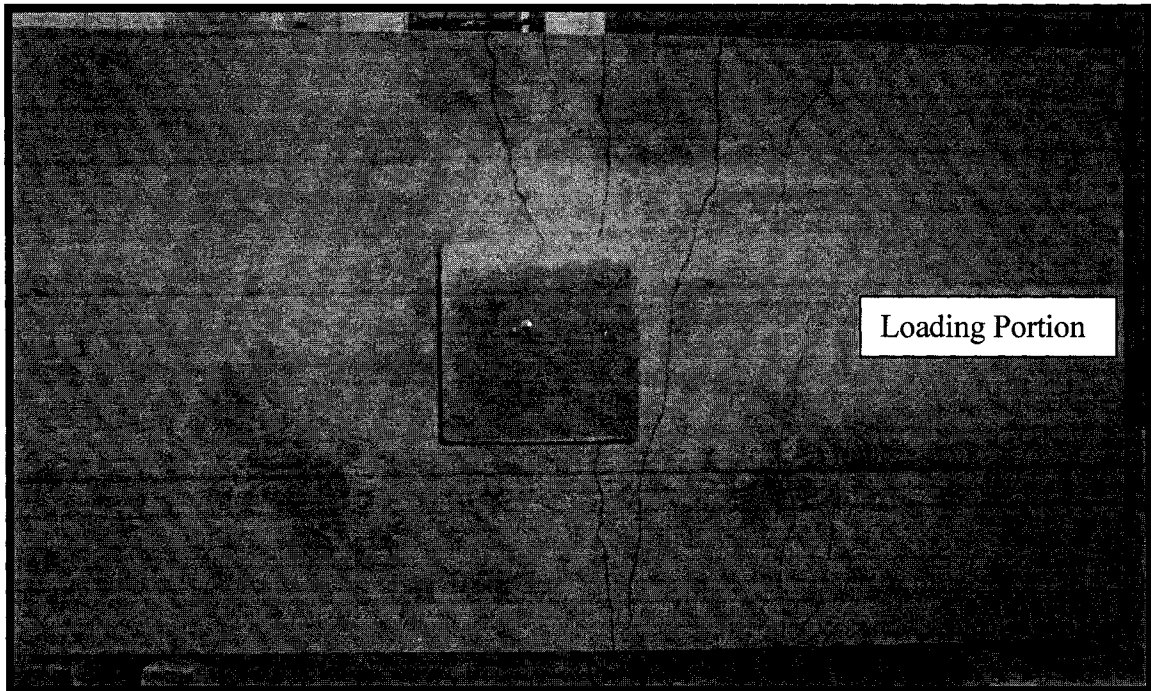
The cracked specimen CRAK35 after failure and transferring
